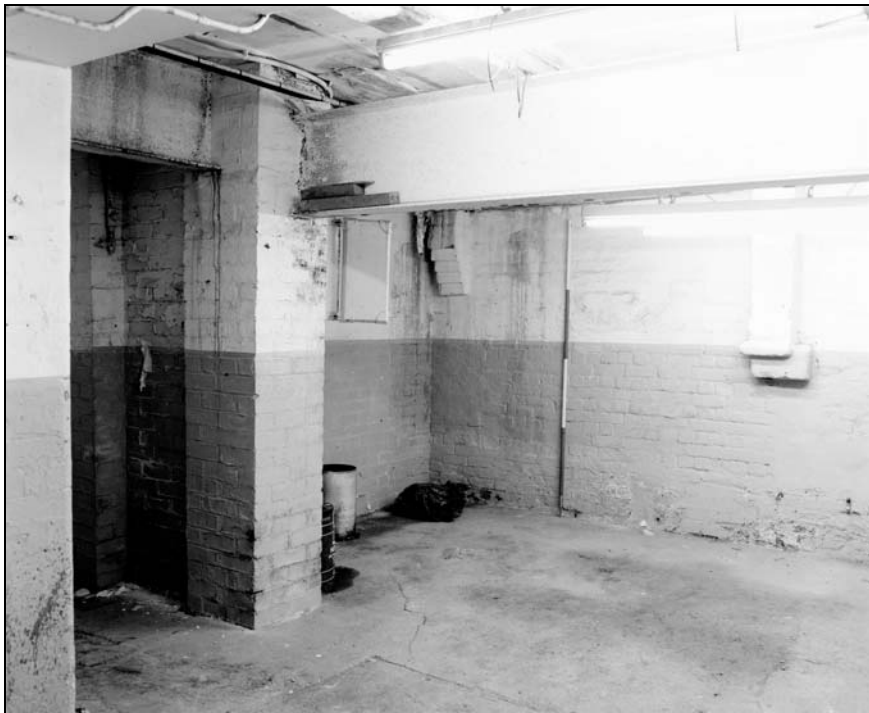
Building 2; ground floor, general shot of insertions and blockings in A13 (Film 11.4)
